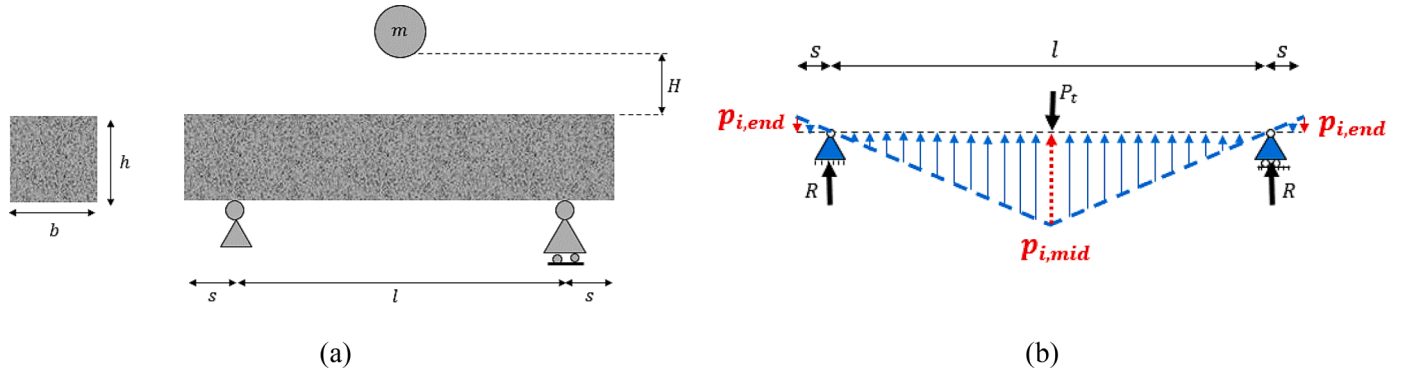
(a) Beam's test setup; (b) Loading condition.
